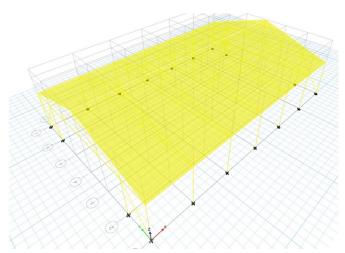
3-Dimensional model of Conventional Steel Building having 24m span Pratt truss
